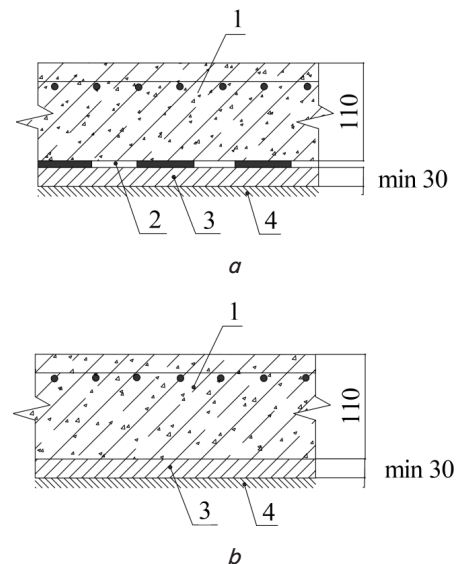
Structure of a roadbed on the reinforced concrete slab: 1 – cement-concrete coating; 2 – waterproofing; 3 – aligning layer; 4 – bridge roadway slab: a – with waterproofing; b – without waterproofing
